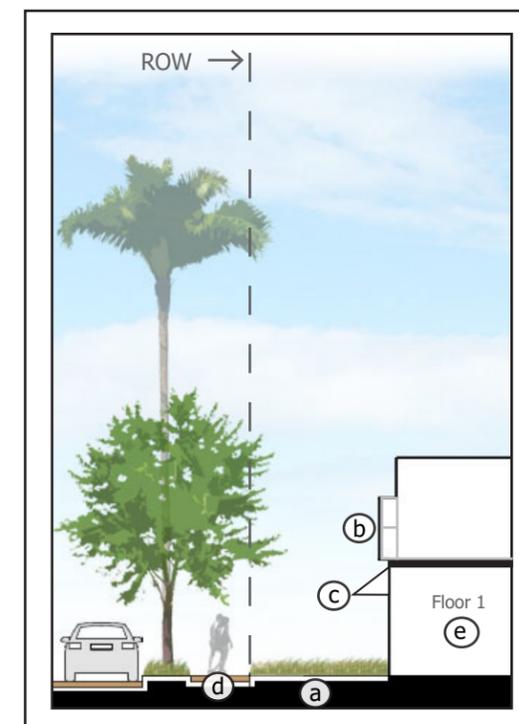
BUILDING PLACEMENT STANDARDS
